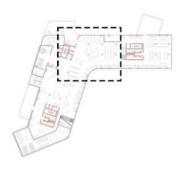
Blowup 1 of Third Floor Plan. Source: Author
